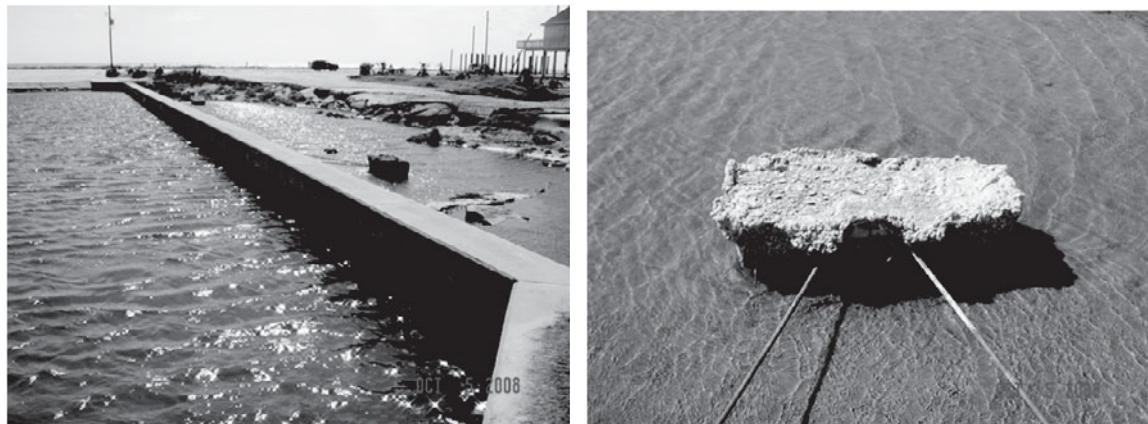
Scour damage on bulkhead (left) and exposed dead-man anchor (right) at Rollover Pass off Highway 87
